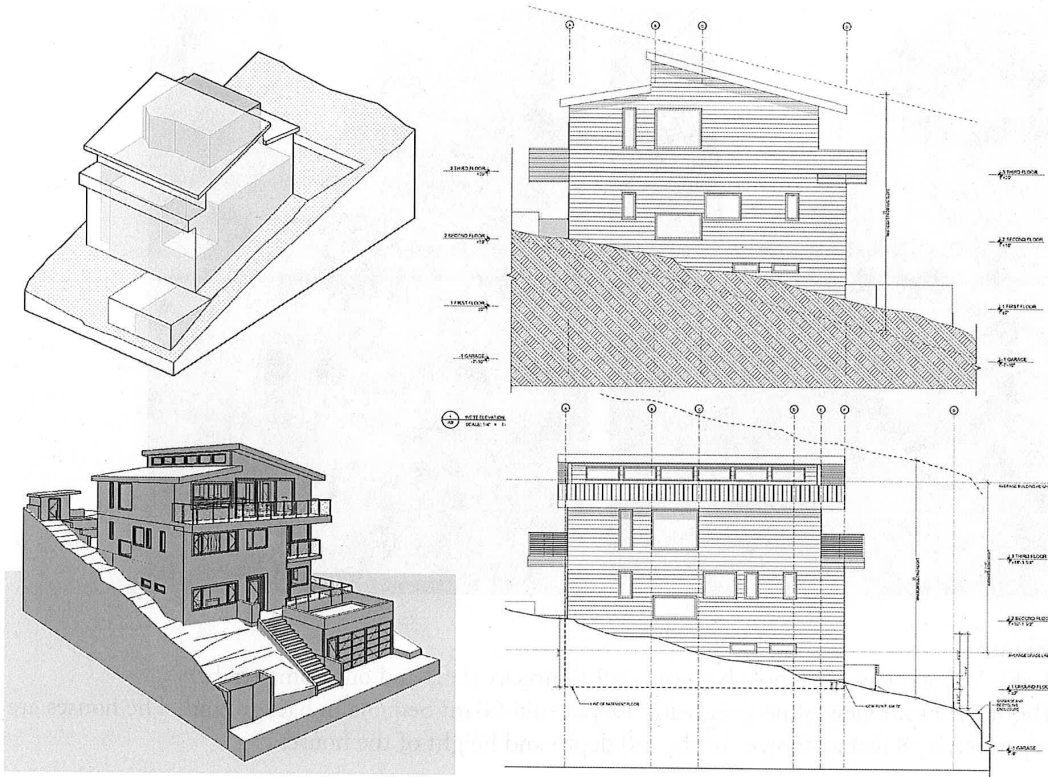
Recent changes in design. We have been sent two versions of the design. Top row: rendering and elevation from previous design sent to us in February 2022, with proposed balcony as opaque siding. Bottom row: rendering and elevation from latest design (uploaded January 3rd, 2023) with proposed balcony as wraparound glass. This change increases loss of privacy concerns.
